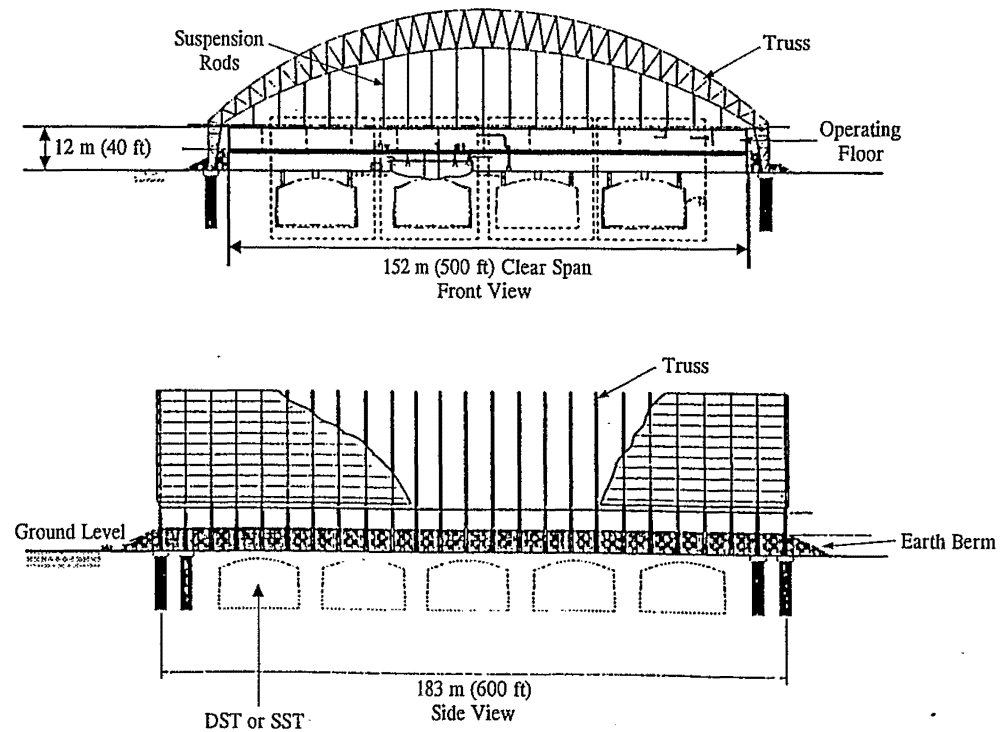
Tank Farm Confinement Facility Elevations
